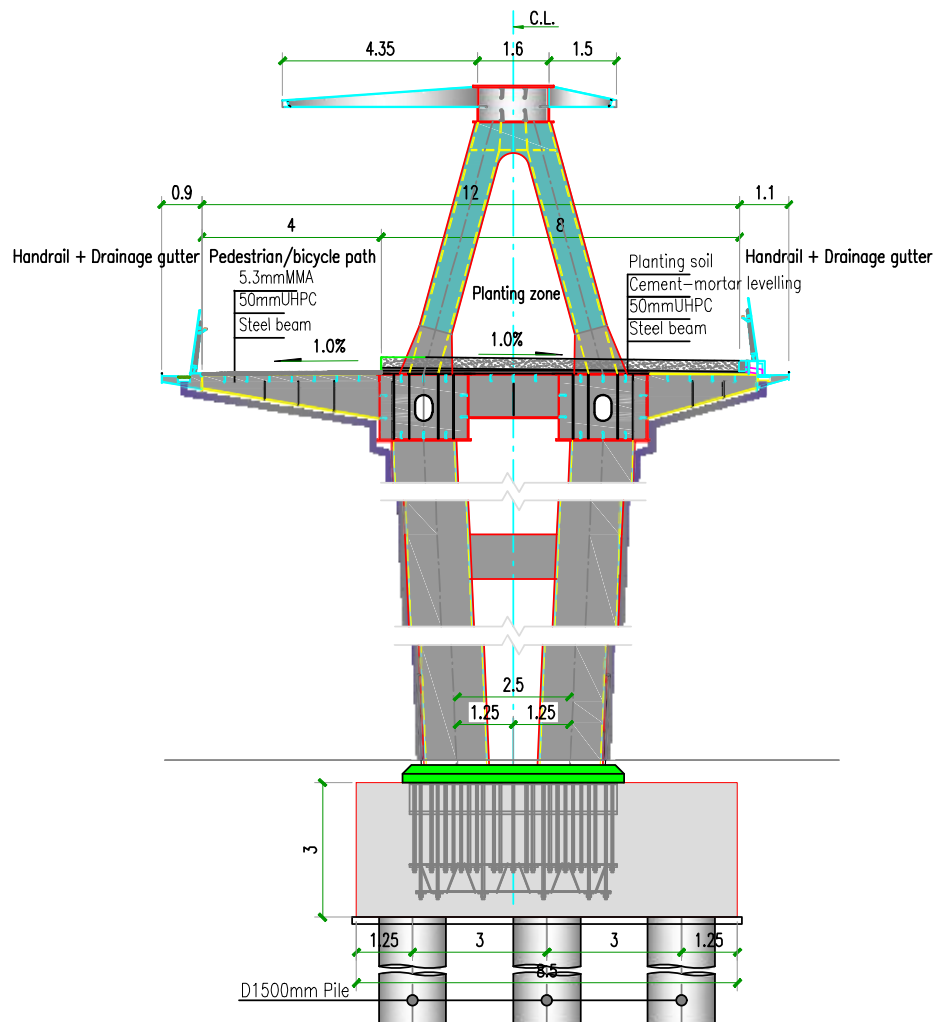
Typical cross-section of Kungpeng Trail Bridge No. 3 (unit: m)
